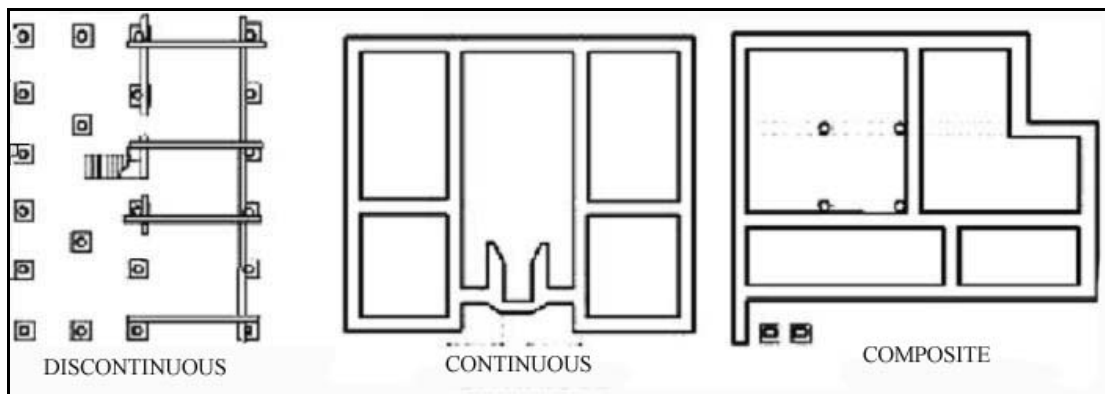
Schematic drawing of foundation types in a timber-framed structure
